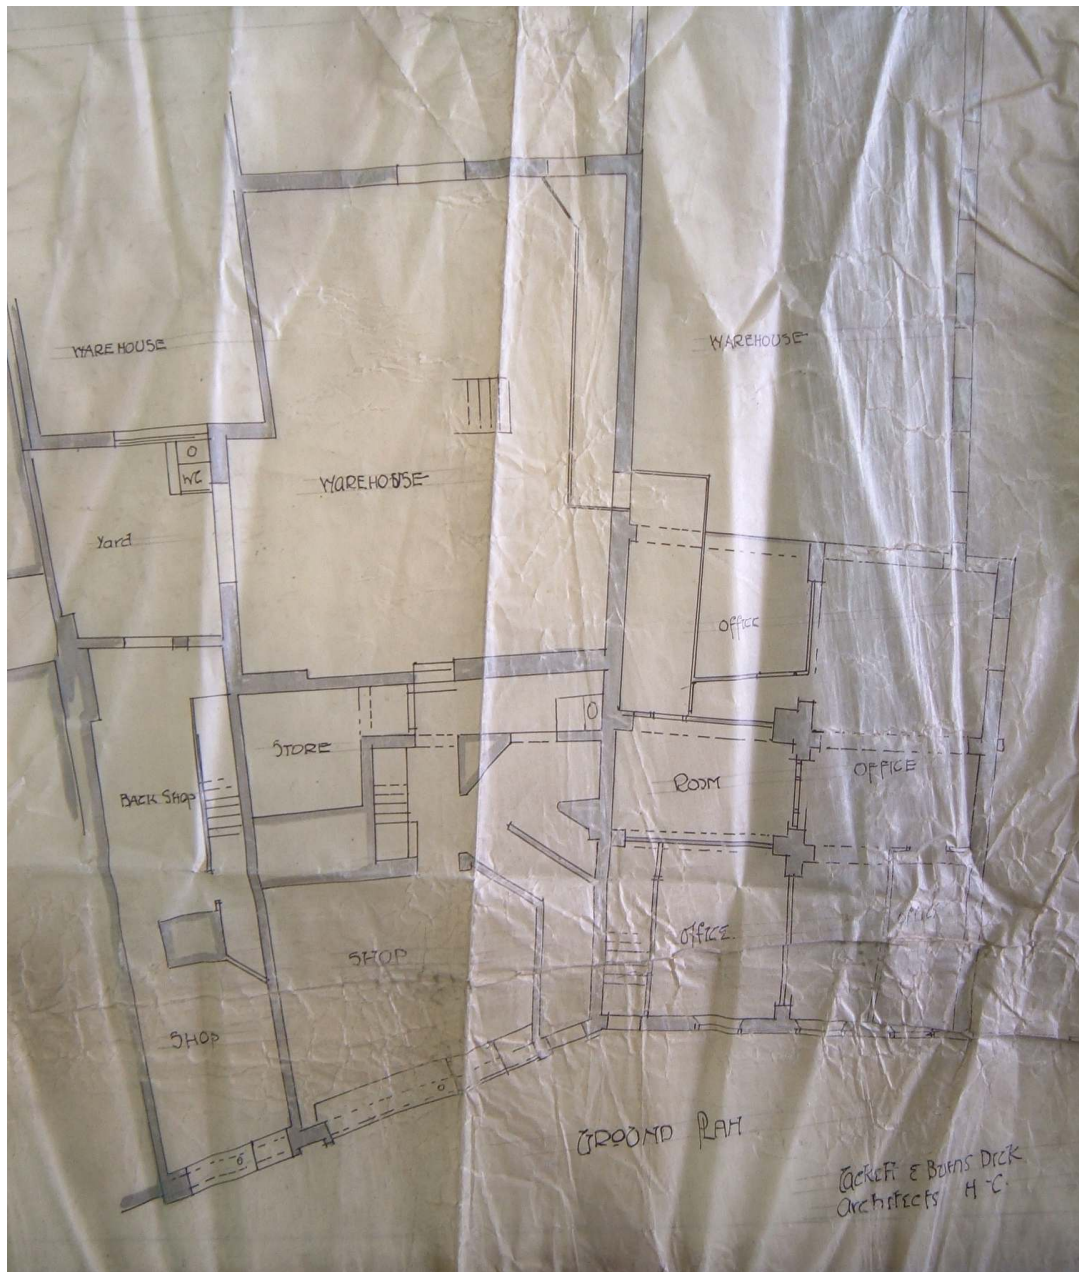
Plan of existing Ward's premises, 31-9 High Bridge,
